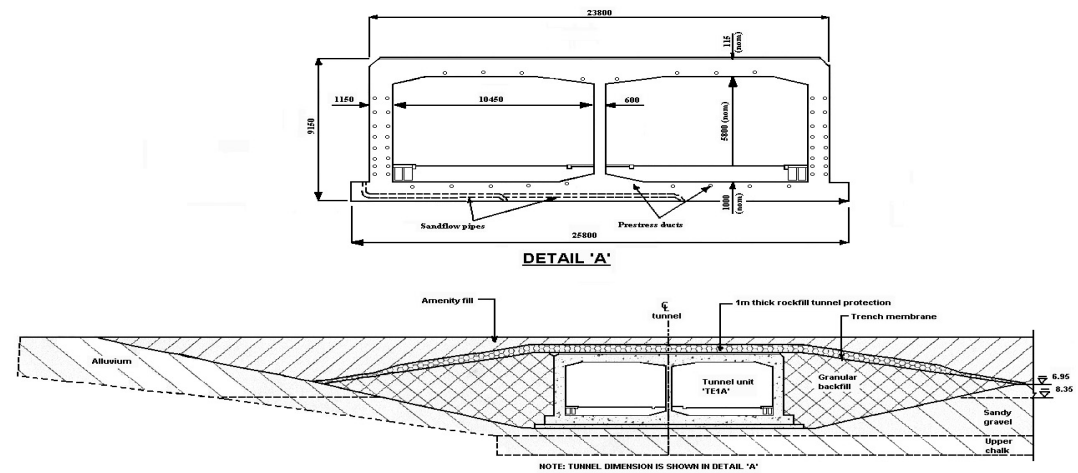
Cross section of medway tunnel in trench (Mainwaring et al., 2000)
